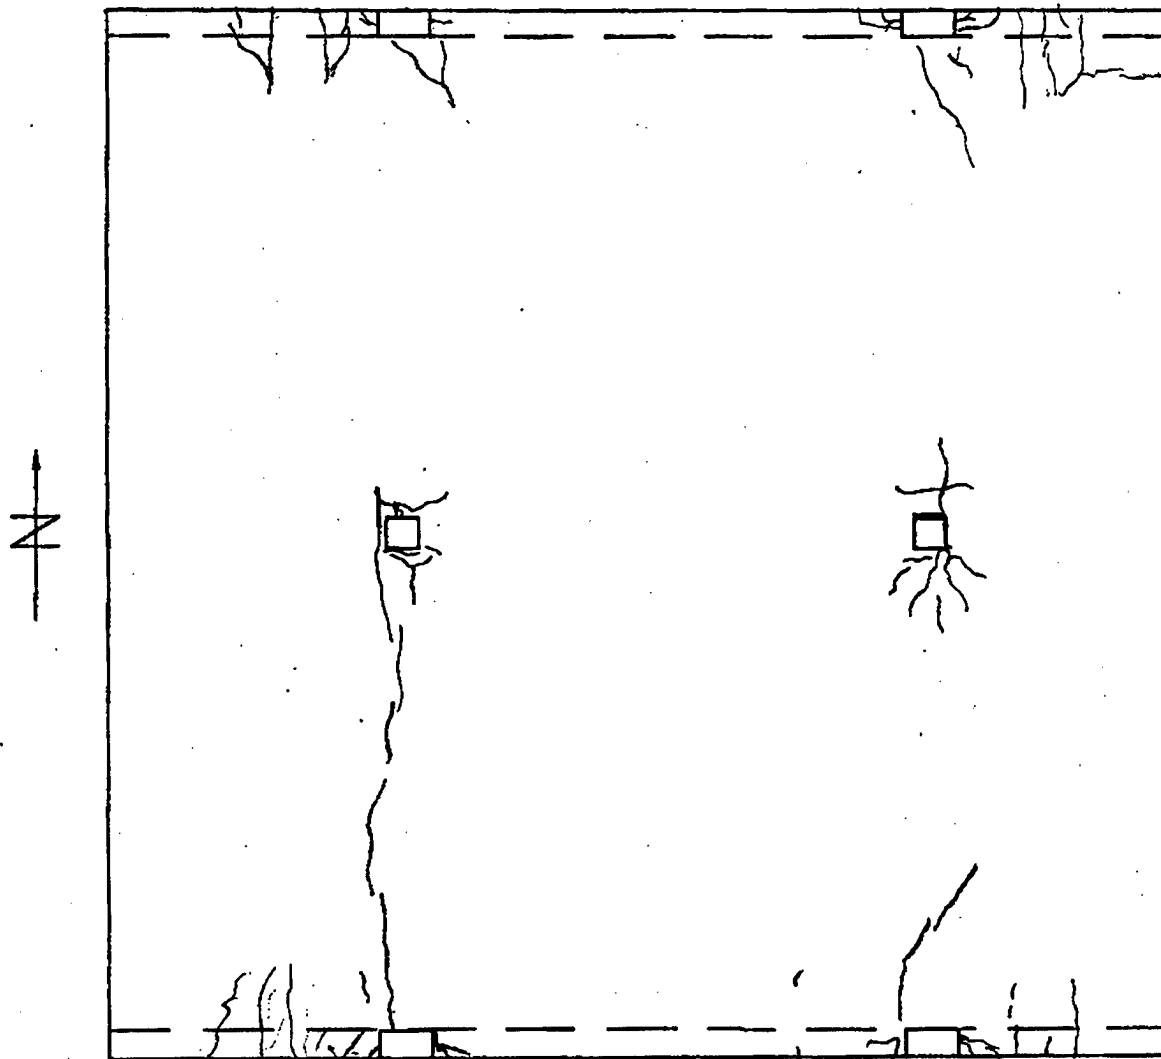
Crack Pattern, Second Floor Slab, Top Side, Pre-Test
